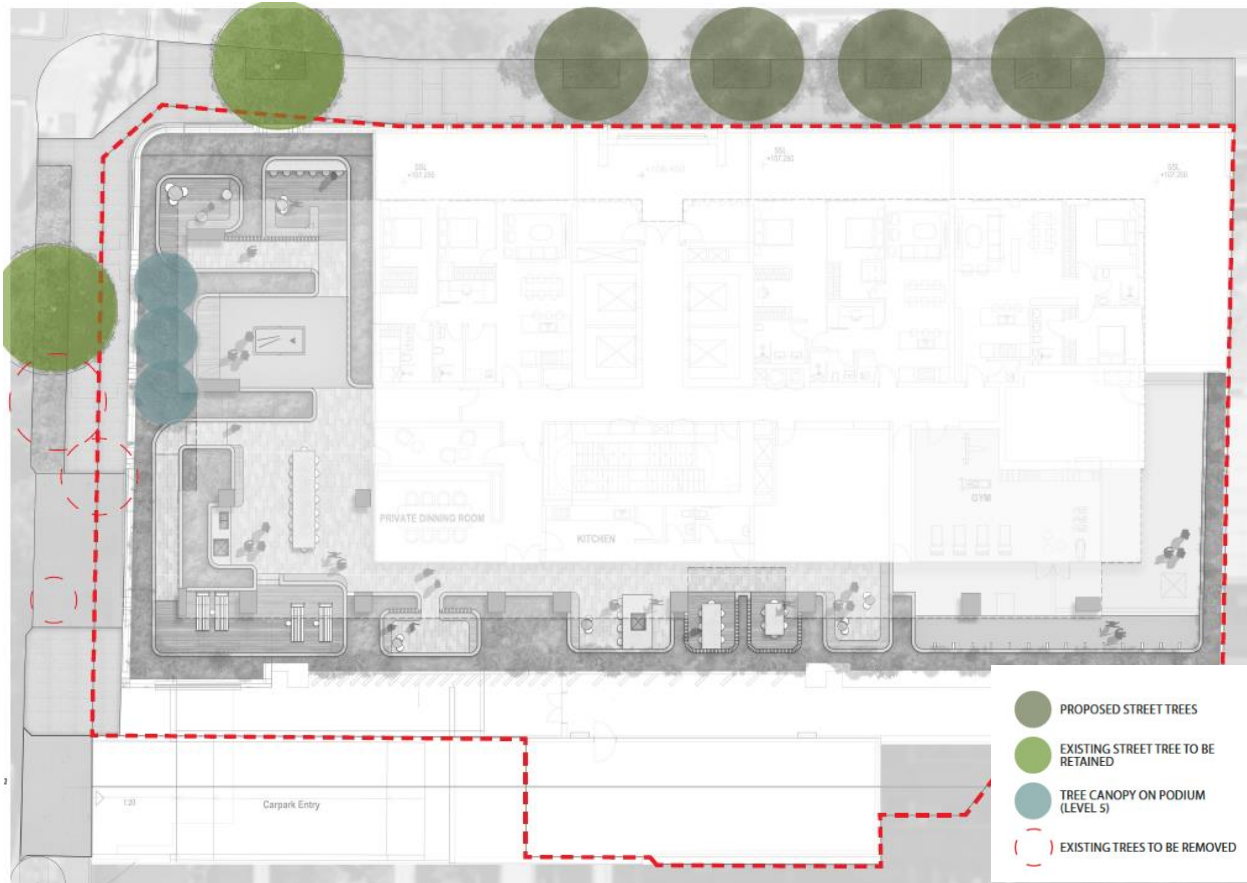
Proposed tree retention and tree planting (Source: Arcadia 2026)
